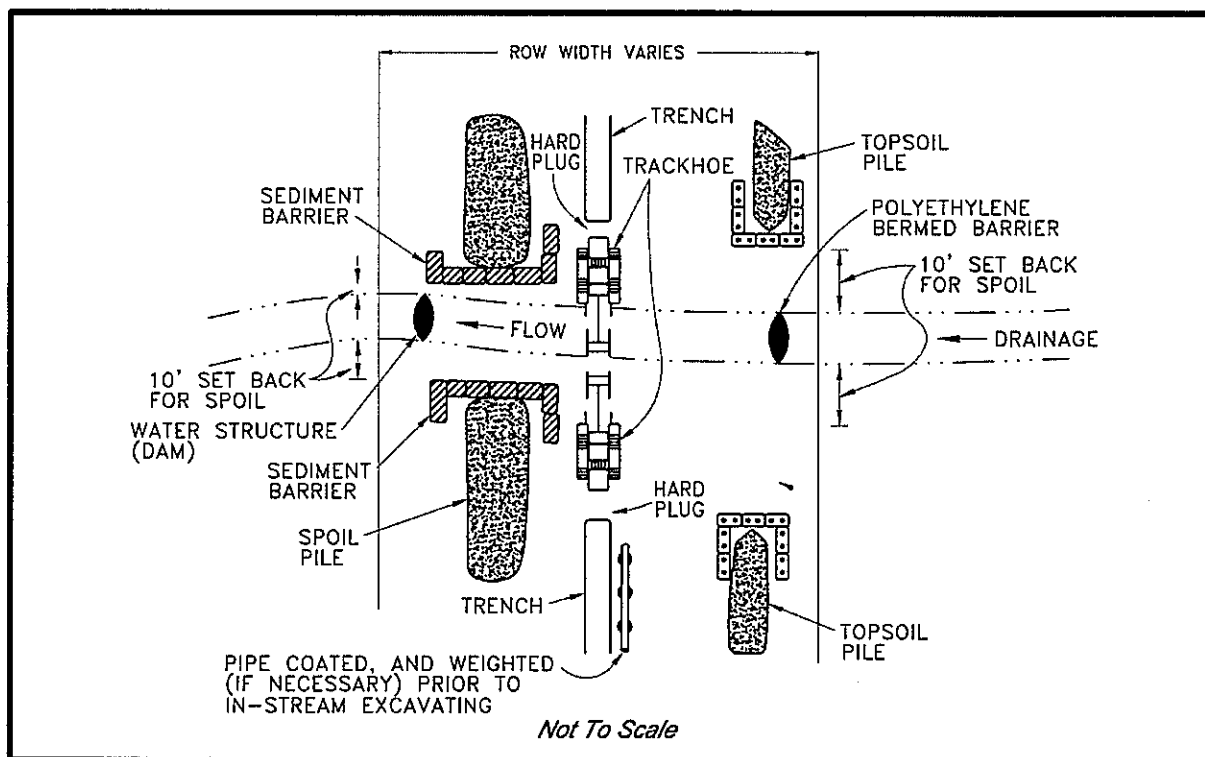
Typical Drawing of Open Cut Method in Dry, Intermittent, or Tiled Drainage Crossings.
